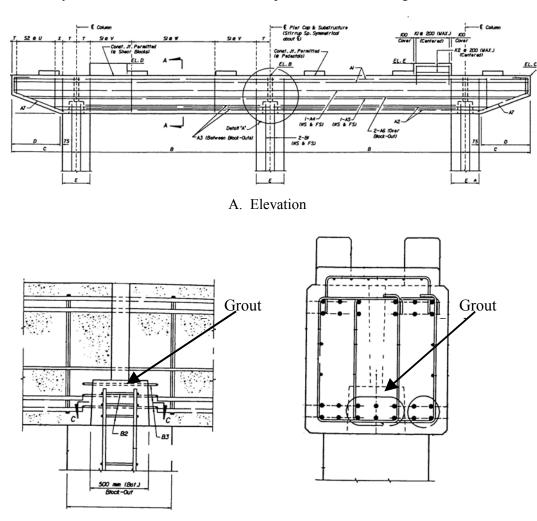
Florida DOT Rectangular Precast Bent Cap for Column Bent [1.23]
